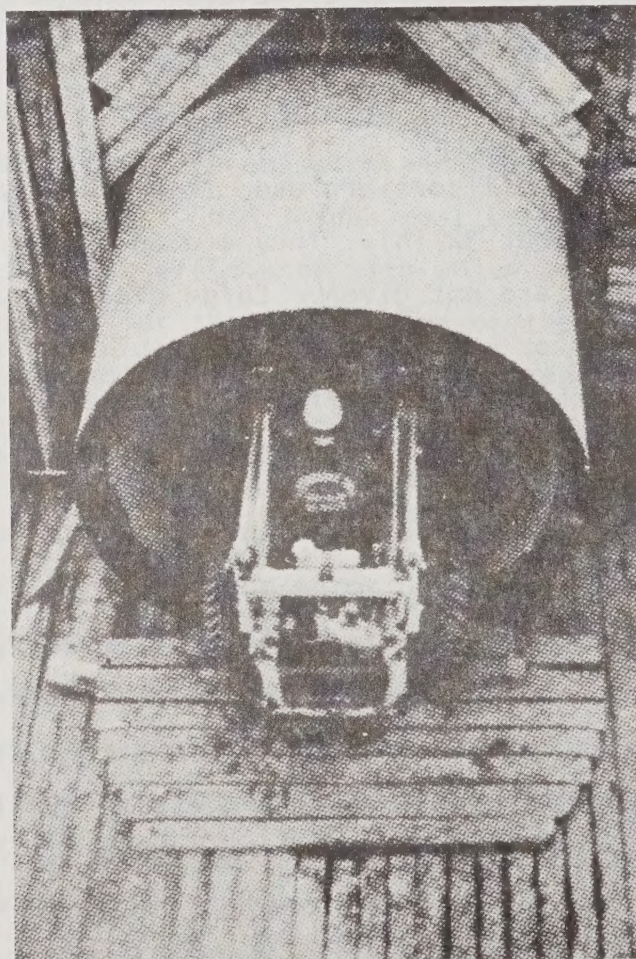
PRESSING CONCRETE PIPES UNDER ROADWAY
